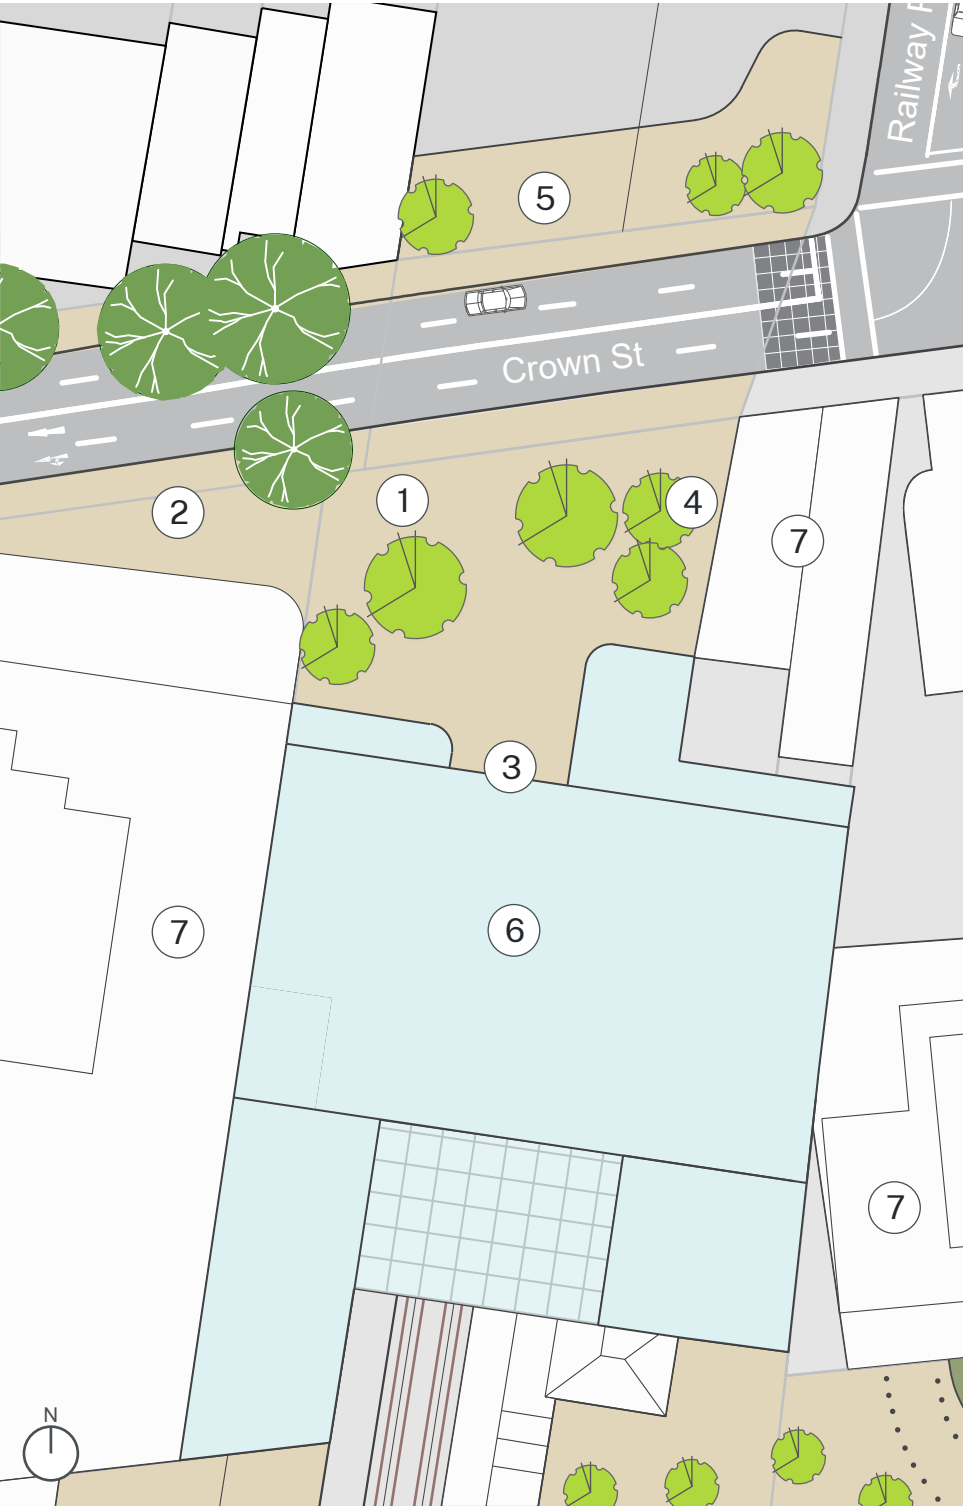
Indicative plan of proposed Crown Street plaza and gateway development
